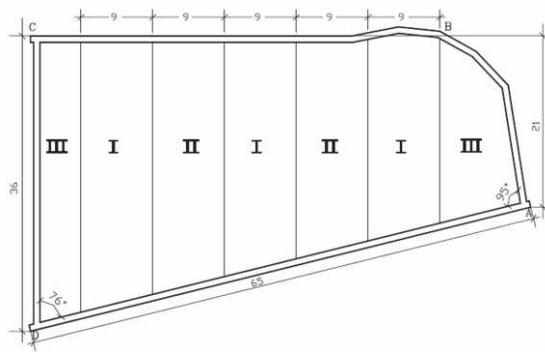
Plan of the construction sequence for the deep excavation at Shanghai New World Commercial City Complex. (Hu et al, 1999)
